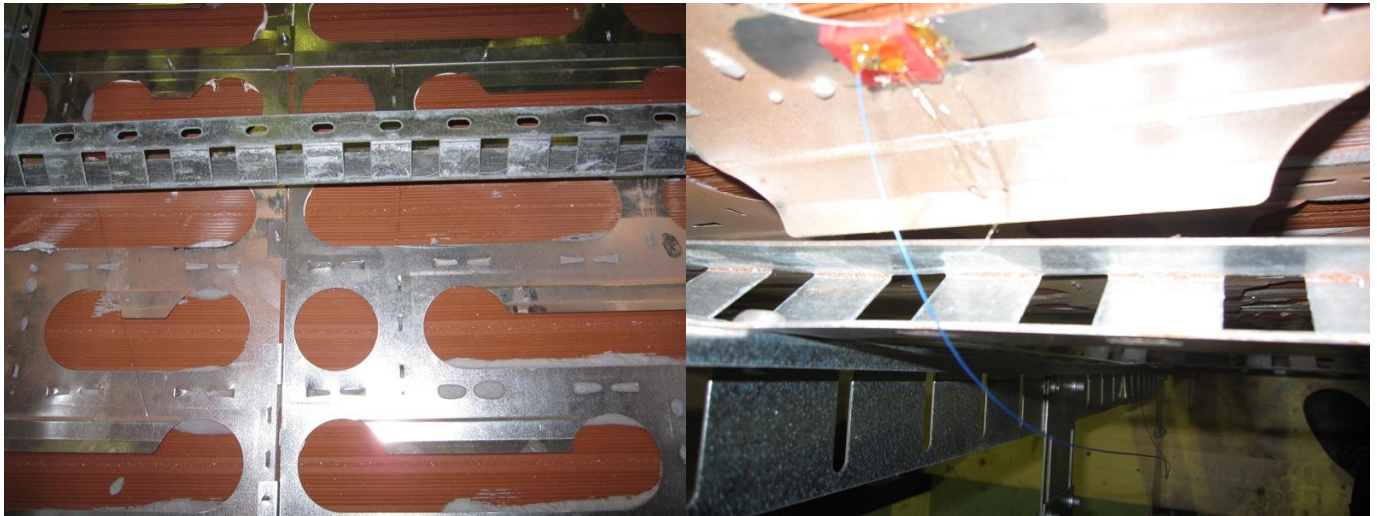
Vertical crack in upper part of element at load pulse 3200 Pa.
